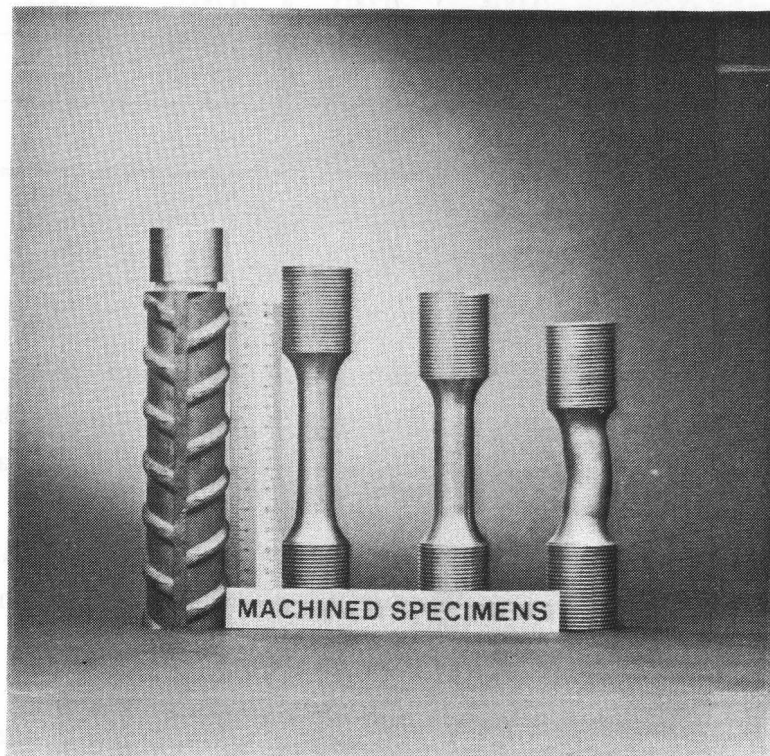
Machined Test Coupons and Virgin Bar.
